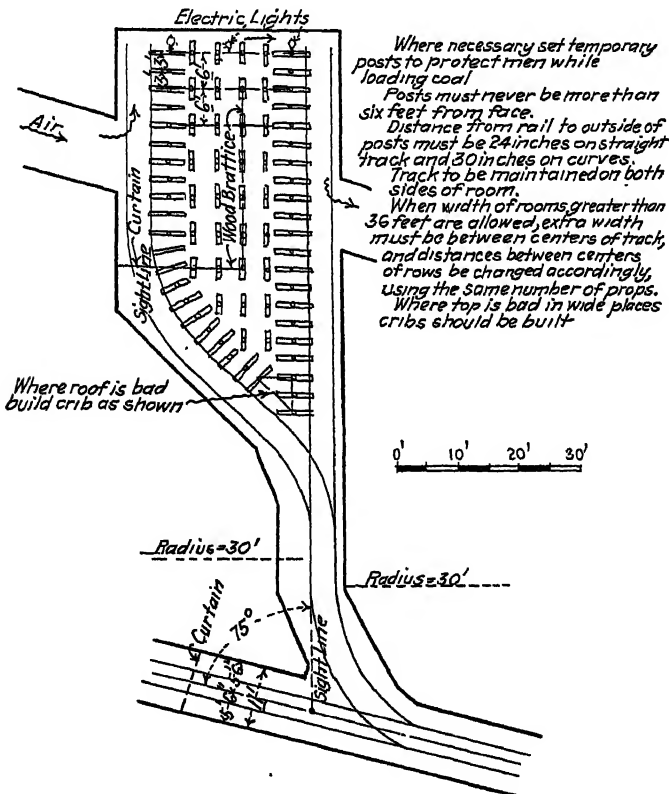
STANDARD TIMBERING FOR 2-TRACK ROOM.
